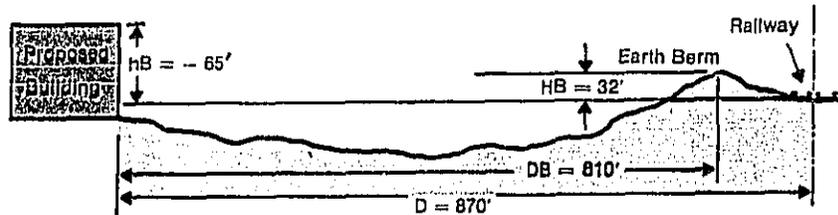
Cross-Section Showing Railway Earth Berm.
